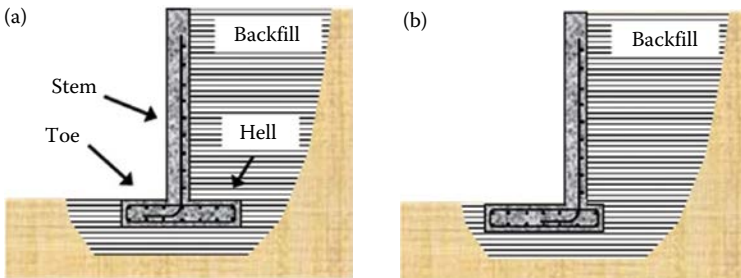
A T-shaped (a) and L-shaped (b) cantilever retaining wall. (Credit: A. Braham.)
